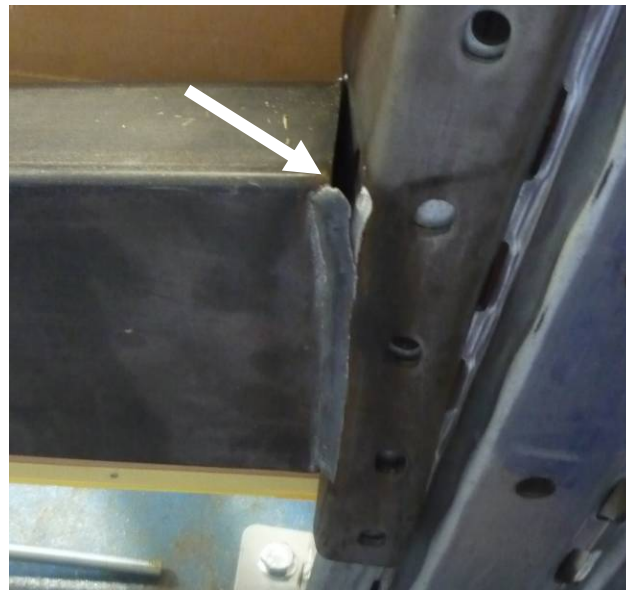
Failure of welding observed in test 130/250-1352B (two sided – welding).
